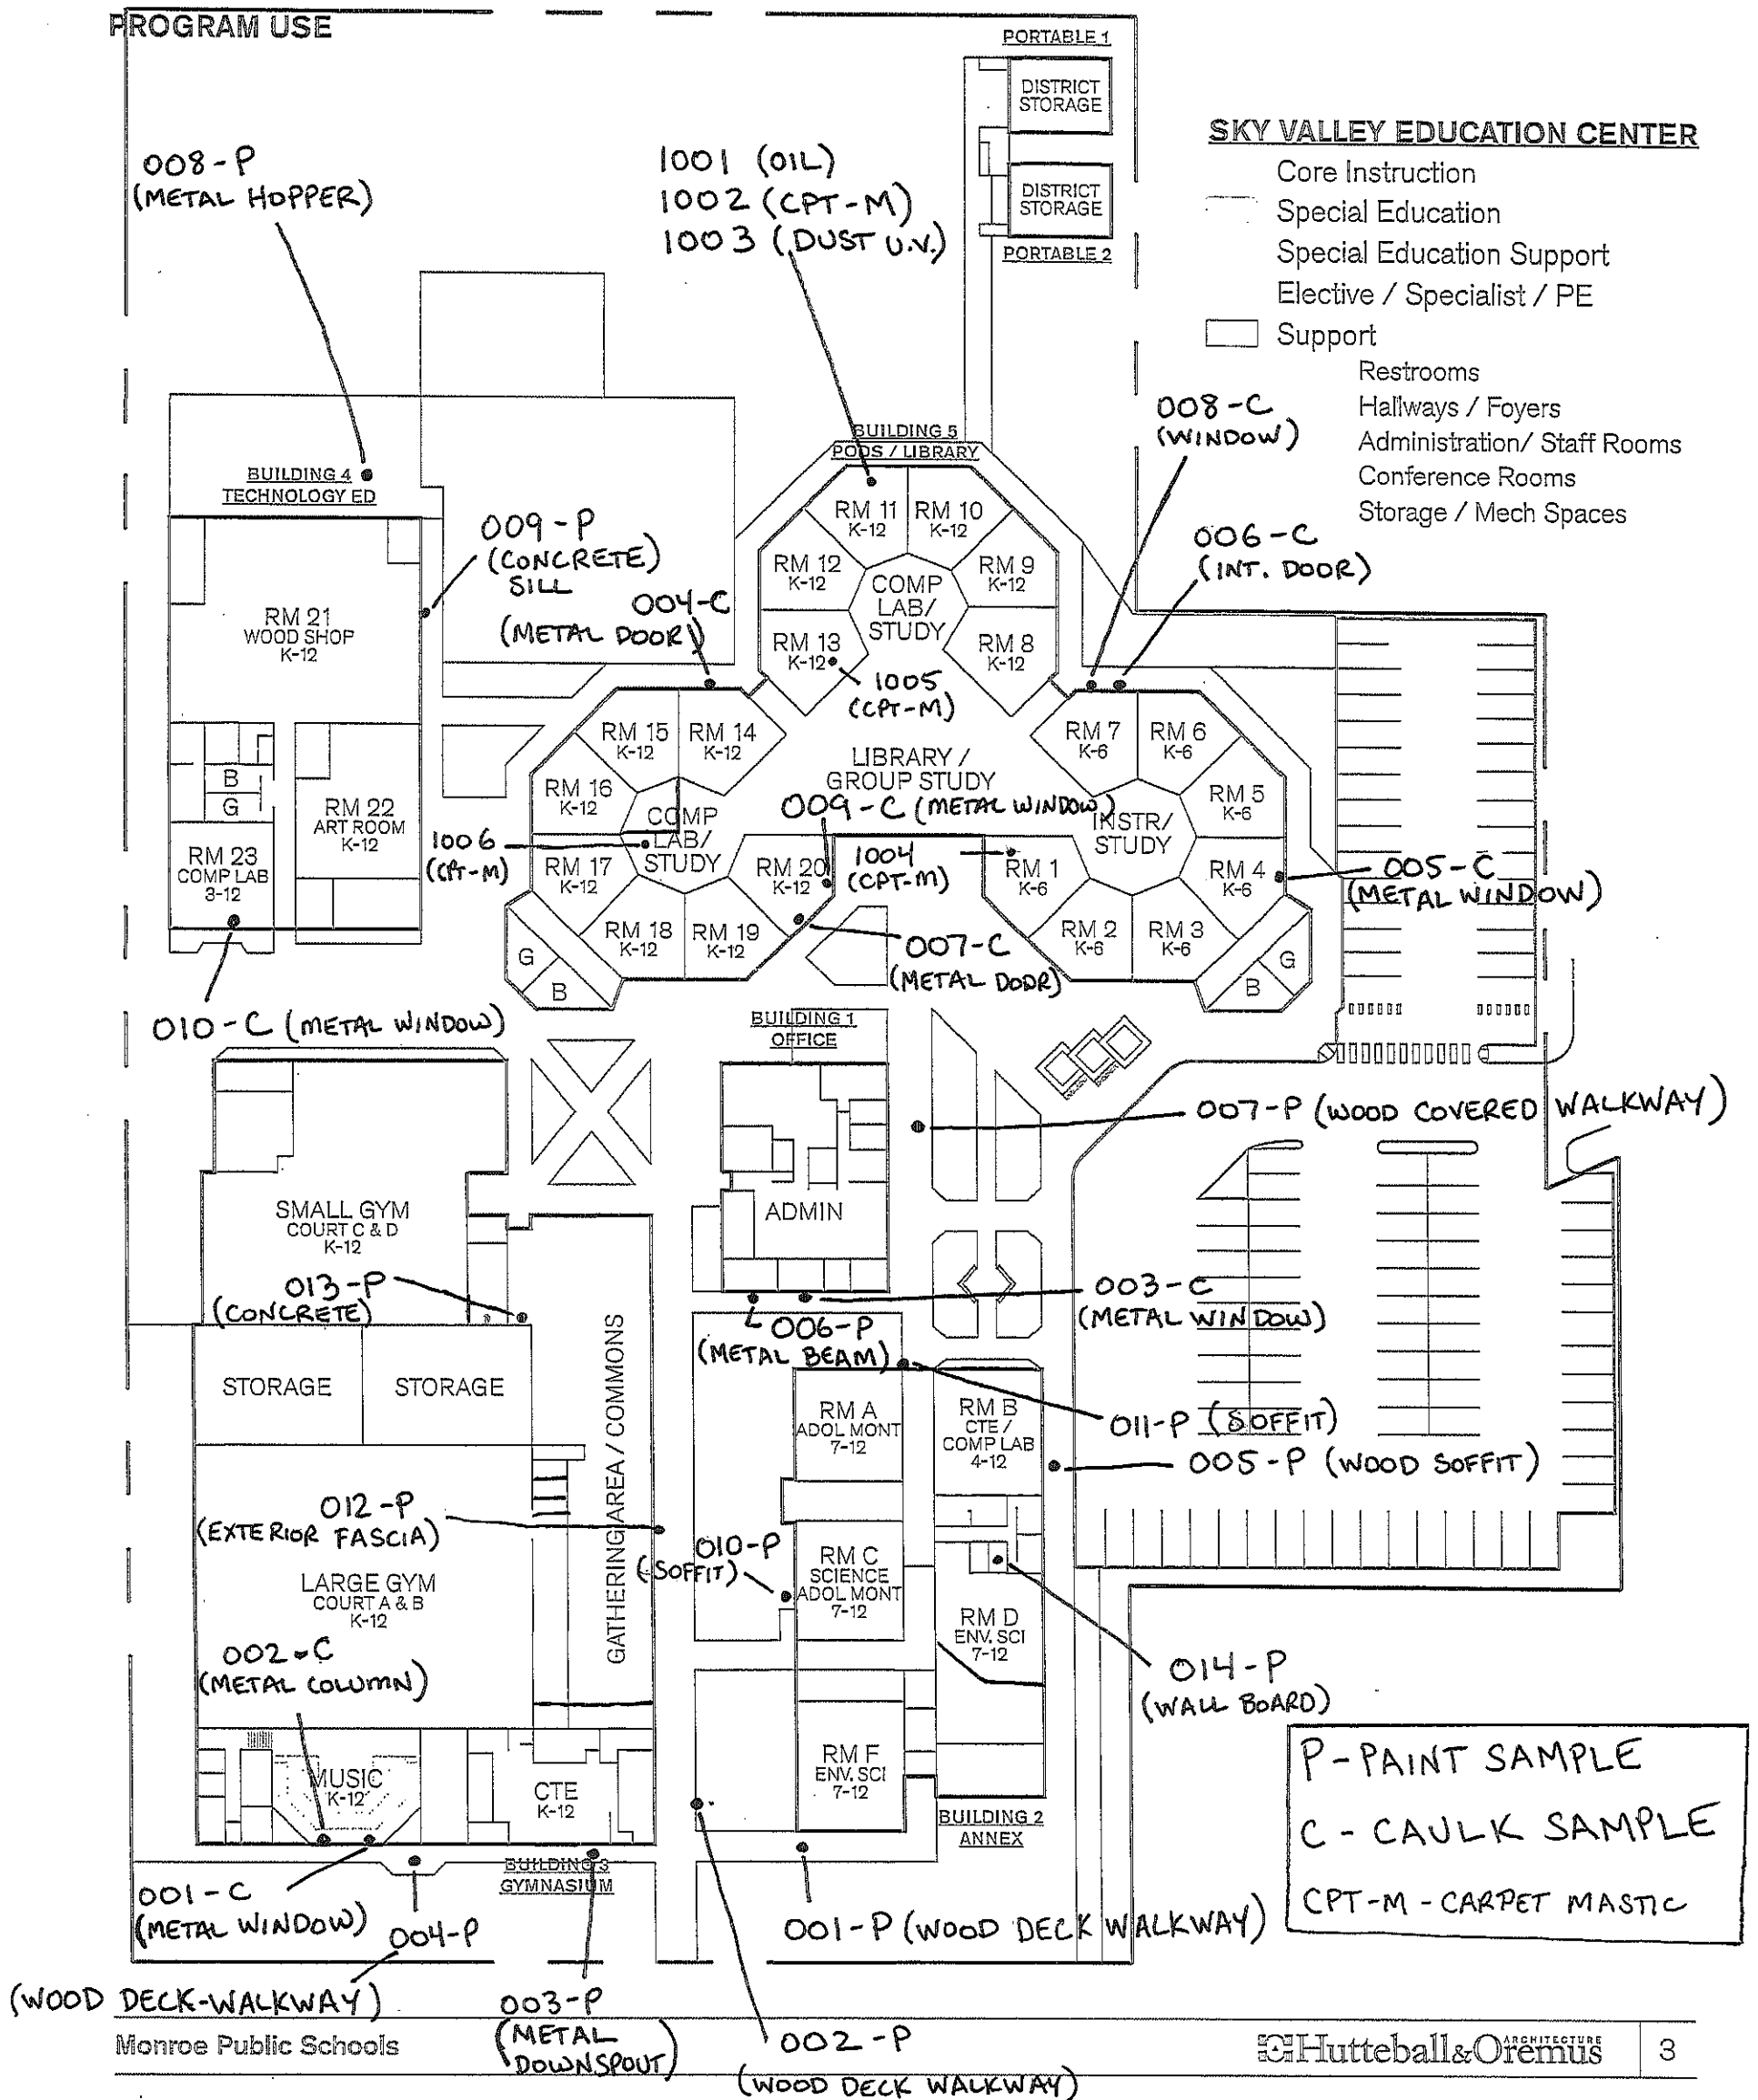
PCB Paint, PCB Caulk, PCB Carpet Mastic
